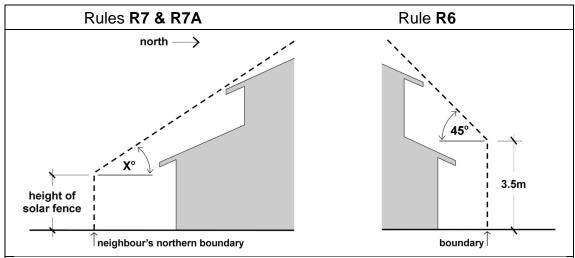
Typical building envelope for rule R6 and solar building envelope for rules R7 & R7A
